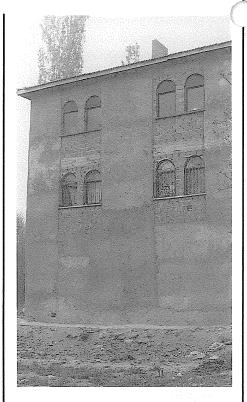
Masonry house retrofitted by grout shell on outside walls.
